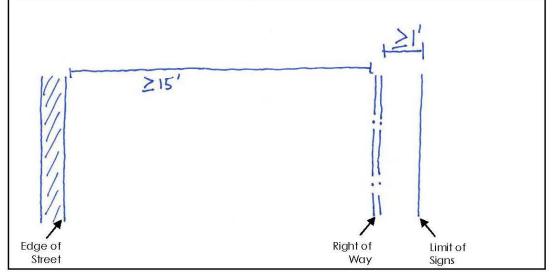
Location of a Free-Standing Sign, No Sidewalk, R.O.W 11-15 Feet From Street
